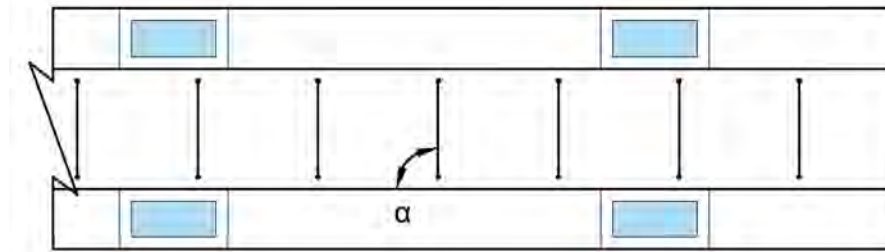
Plan View of 0 Degree Skewed ITBC
